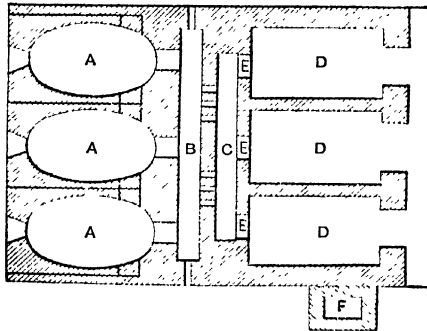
Plan showing Combined Coke Ovens and Plaster Kilns.
